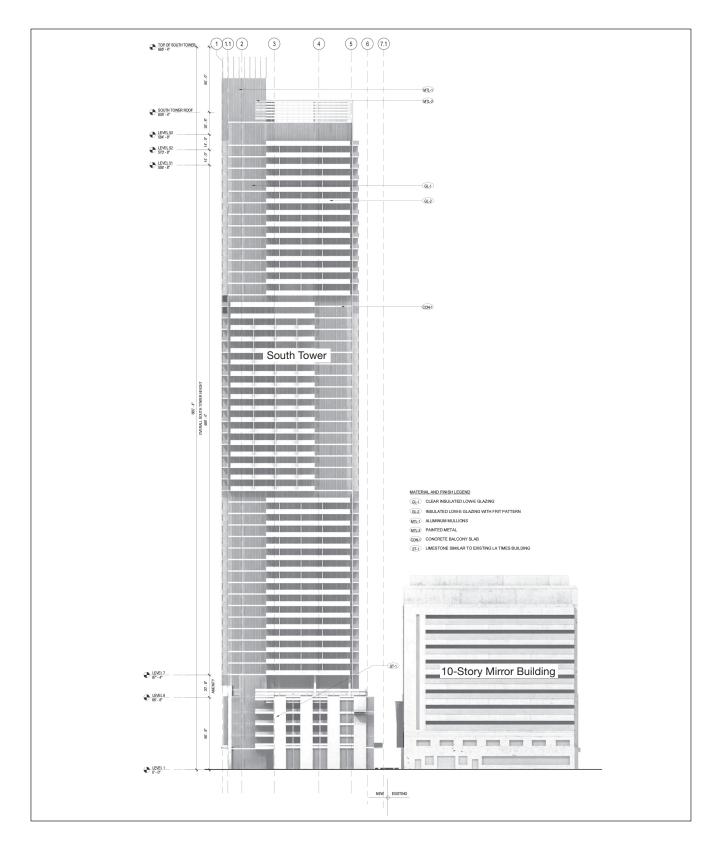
, *South Elevation as Viewed from W. 2nd Street*, illustrates the appearance of the Project as viewed from the area to the south. This elevation also illustrates the relative height differences between the 10-story Mirror Building and 53-story South Tower. In this elevation, the 53-story South Tower would obscure the 37-story North Tower. A proposed 30-story building just to the south of W. 2nd Street would block direct views of the Project Site from the south; however, the Project would be visible from the Metro's proposed 2nd Street/Broadway Station, planned just to the south across W. 2nd Street. It would also be highly visible through the S. Spring Street and S. Broadway corridors. The strong horizontal architectural component of the South Tower would complement the horizontal component of the Mirror Building. The proposed Paseo between W. 2nd Street and W. 1st Street would create a visual and physical separation between the South Tower and the Mirror Building.
